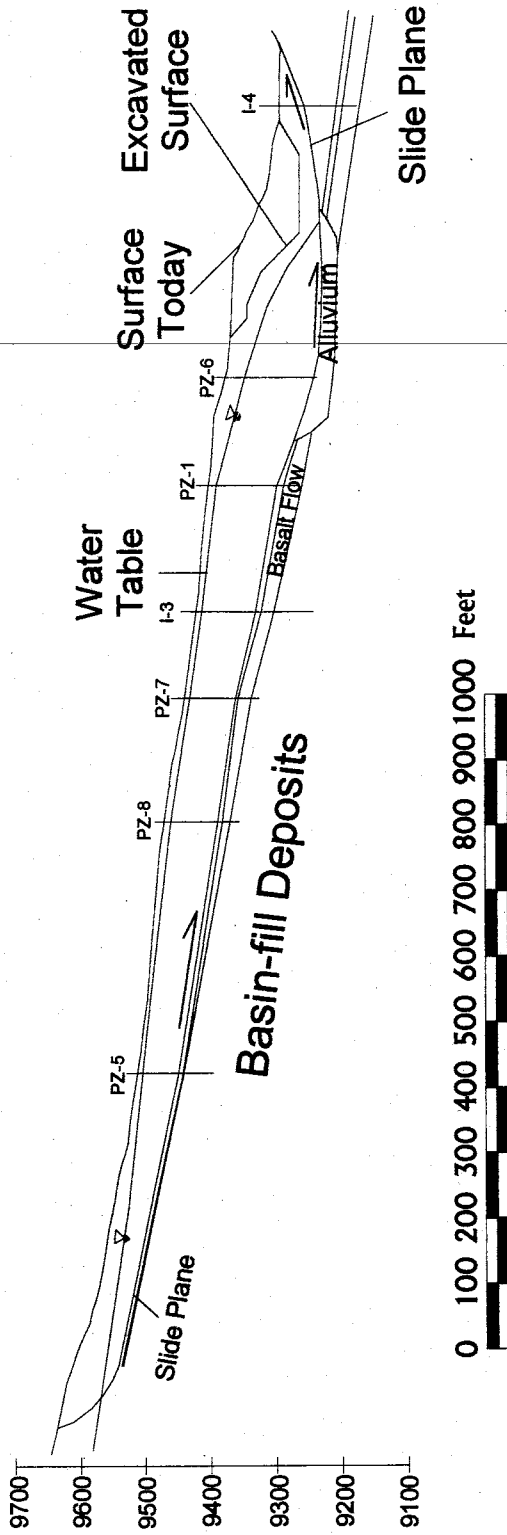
Cross section showing water table and spillway excavation. The spillway ramp and stilling basin excavation is labeled on the figure. The water table profile is nearest to the ground surface around I-3, which is where springs were located before construction activities. The buried channel acts like a drain and captures all water flowing within the landslide.
